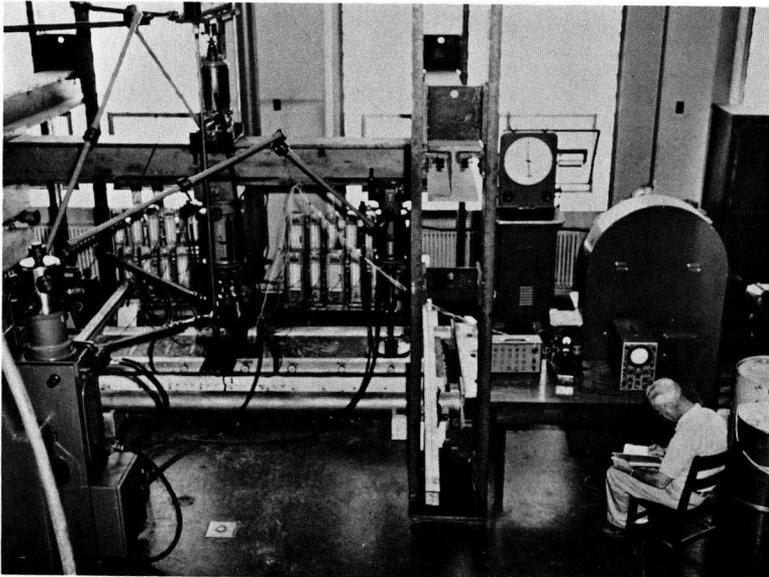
General view of longitudinal and vertical loading arrangement, slab 8.
